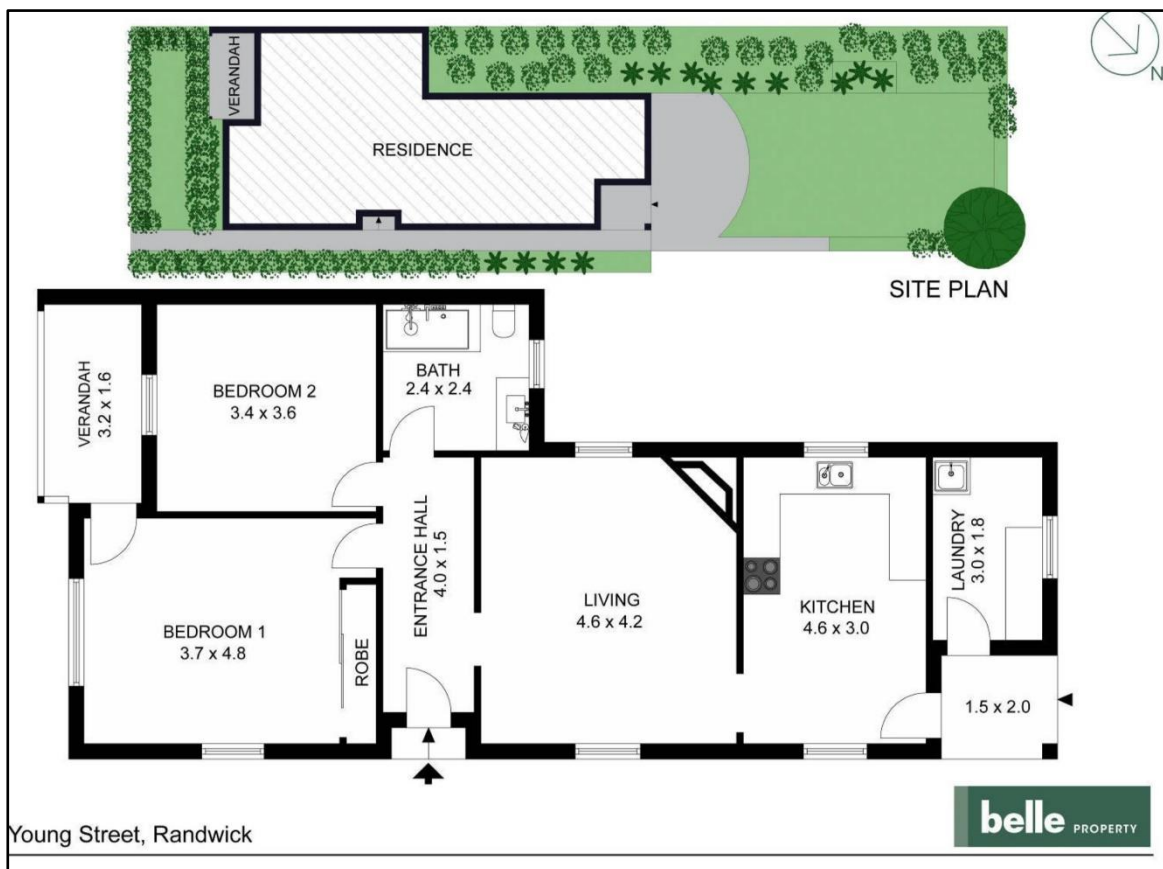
Floor Layout of 24 Young Street, Randwick (south-adjointing neighbour – Source: www.realestate.com.au August 2021)
